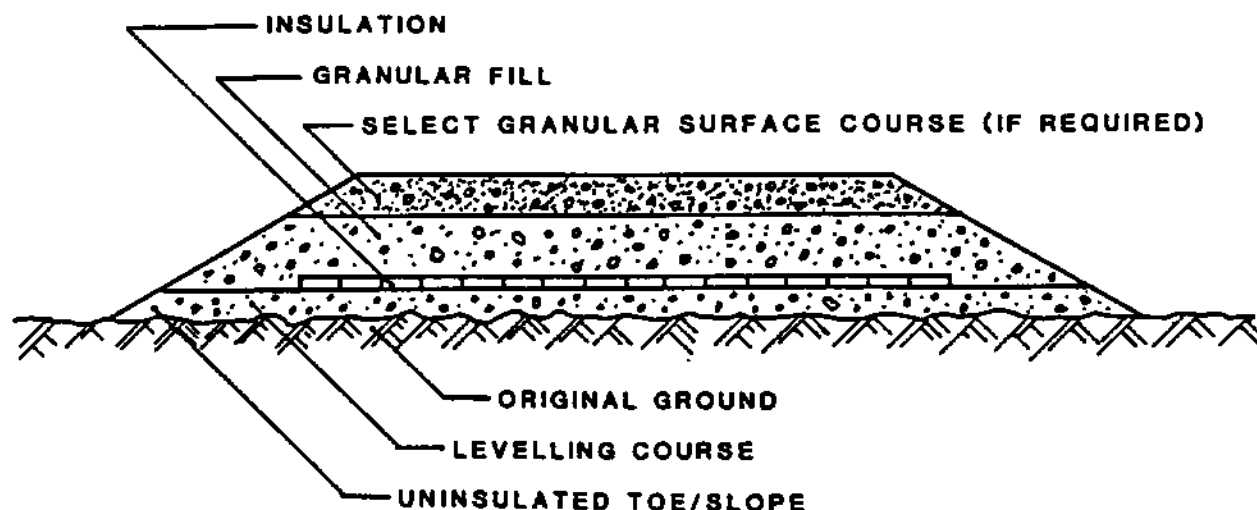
TYPICAL INSULATED EMBANKMENT
